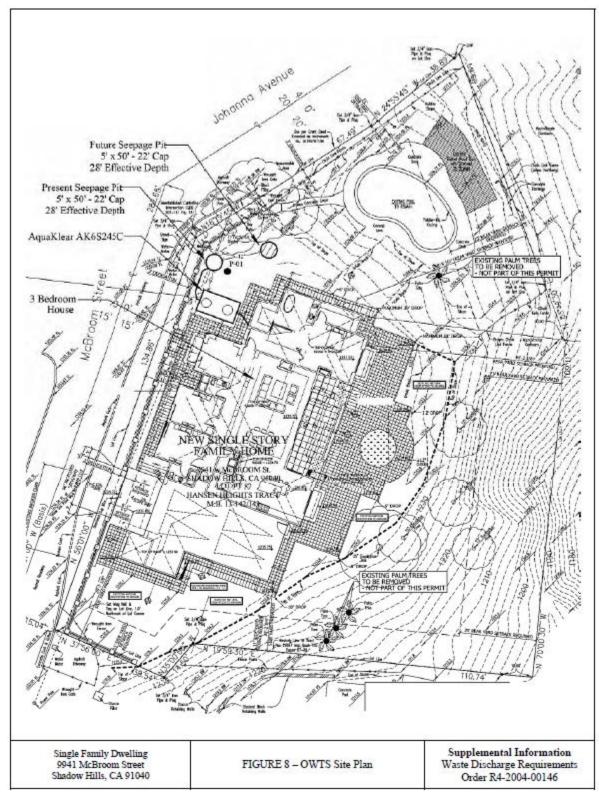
Site Plan of the New House and the Advanced Onsite Wastewater Treatment System
